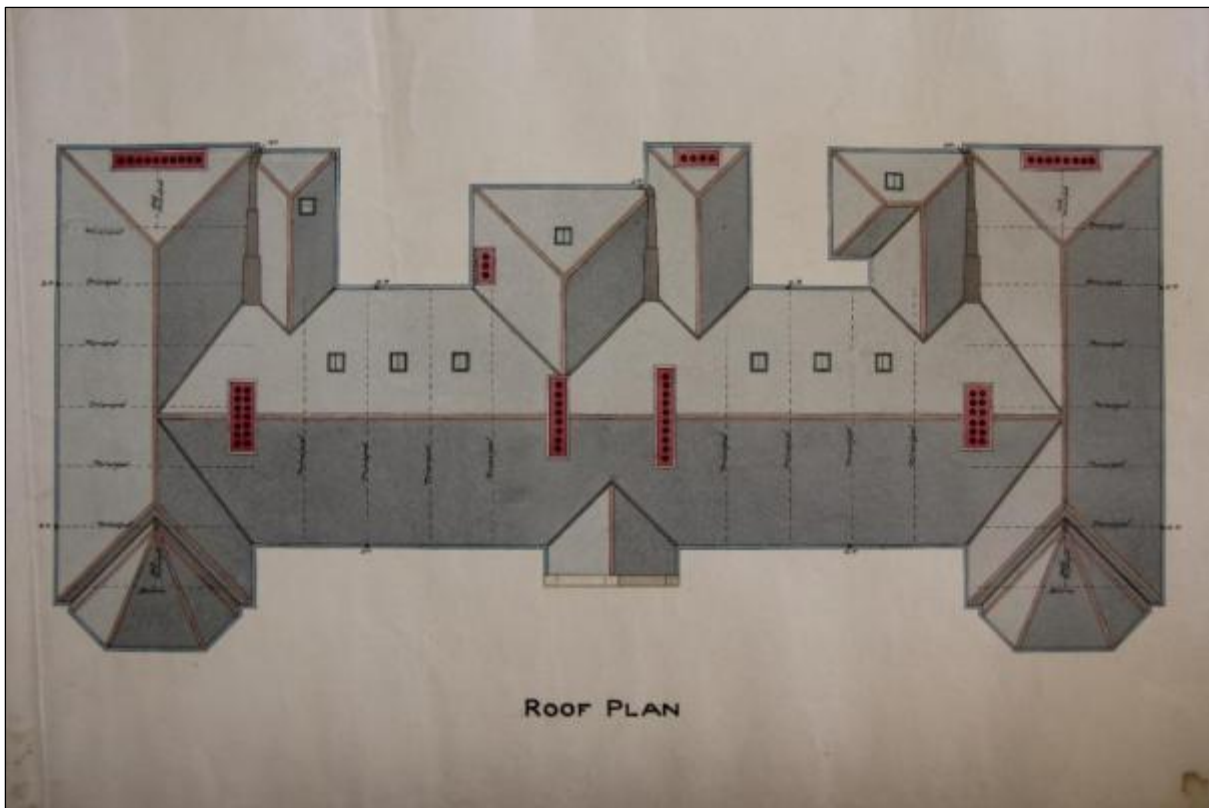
Mary Immaculate College Roof Plans - Irish Architectural Archive
